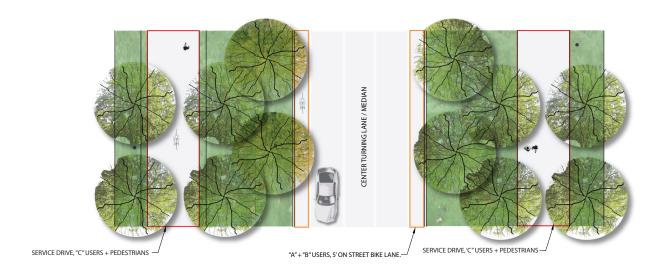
Southern Parkway: Zone 3 Prototypical Section & Plan
